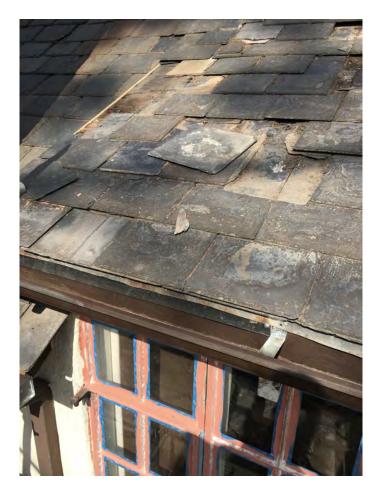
Slate roof condition (detail), 2017. Photo credit: Stuart Gulland
